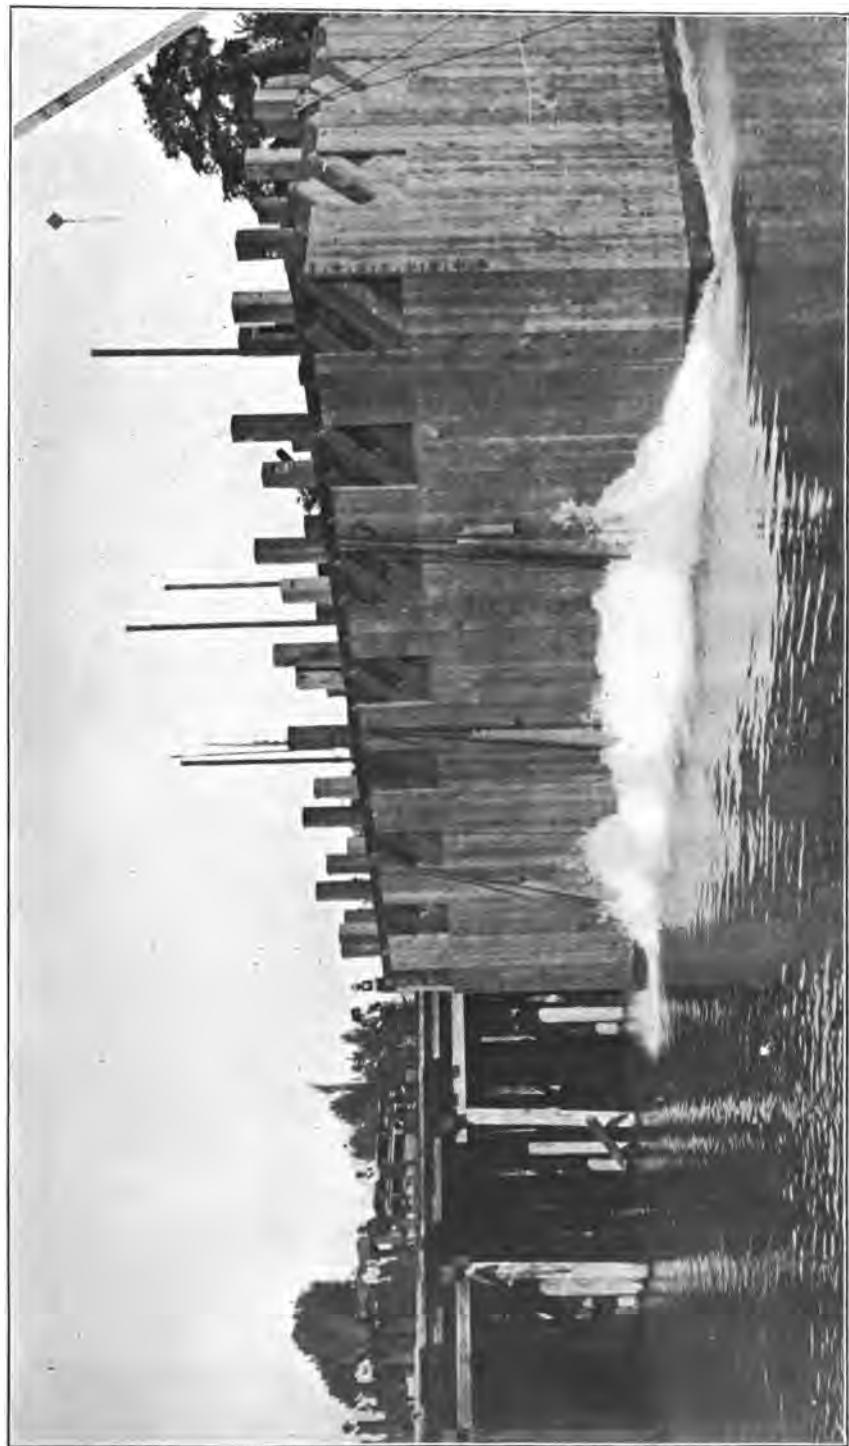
LAUNCHING CAISSON OF PIER IX, COLUMBIA RIVER BRIDGE.
